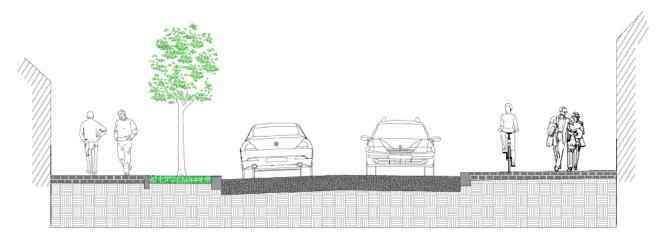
Typical Proposed Cross Section – Existing N2 Chapel Street (Section at Ch. 35)
